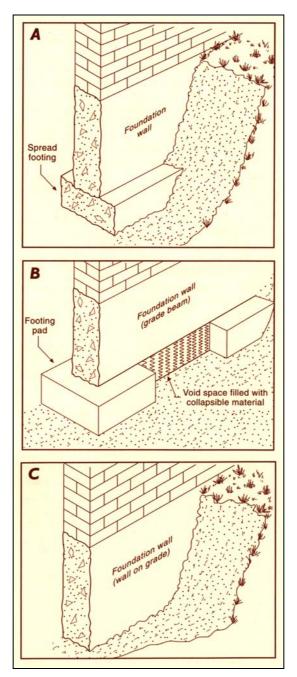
Shallow footing-and-wall type foundation systems. (A) Spread footing. (B) Discontinuous footing pad. (C) Wall-on-grade. From Noe and others (1997); modified from Holtz and Hart (1978).
